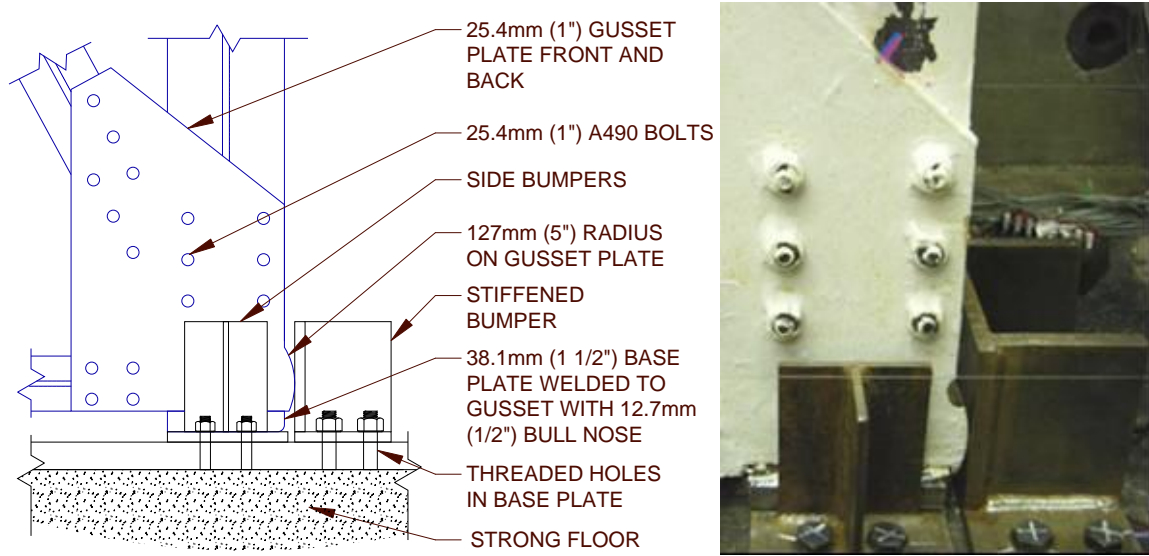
Column Base Detail Allowing Pivoting and Uplifting
